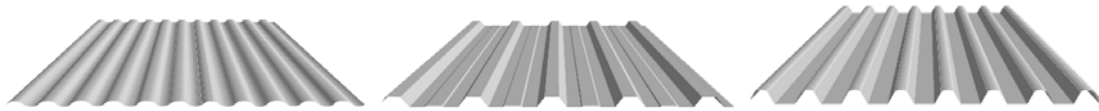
Typical corrugated (left), trapezoidal rib/pan (centre) and square rib (right) profiles
